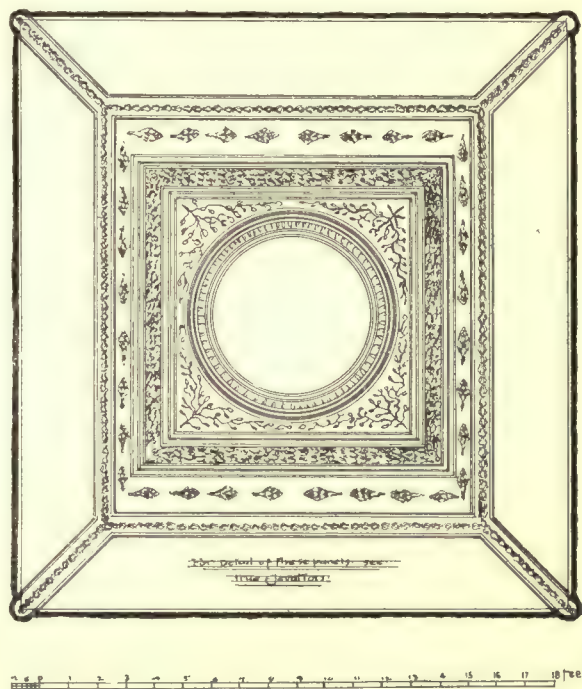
Plan of Ceiling in Vine Room, Kellie Castle.
